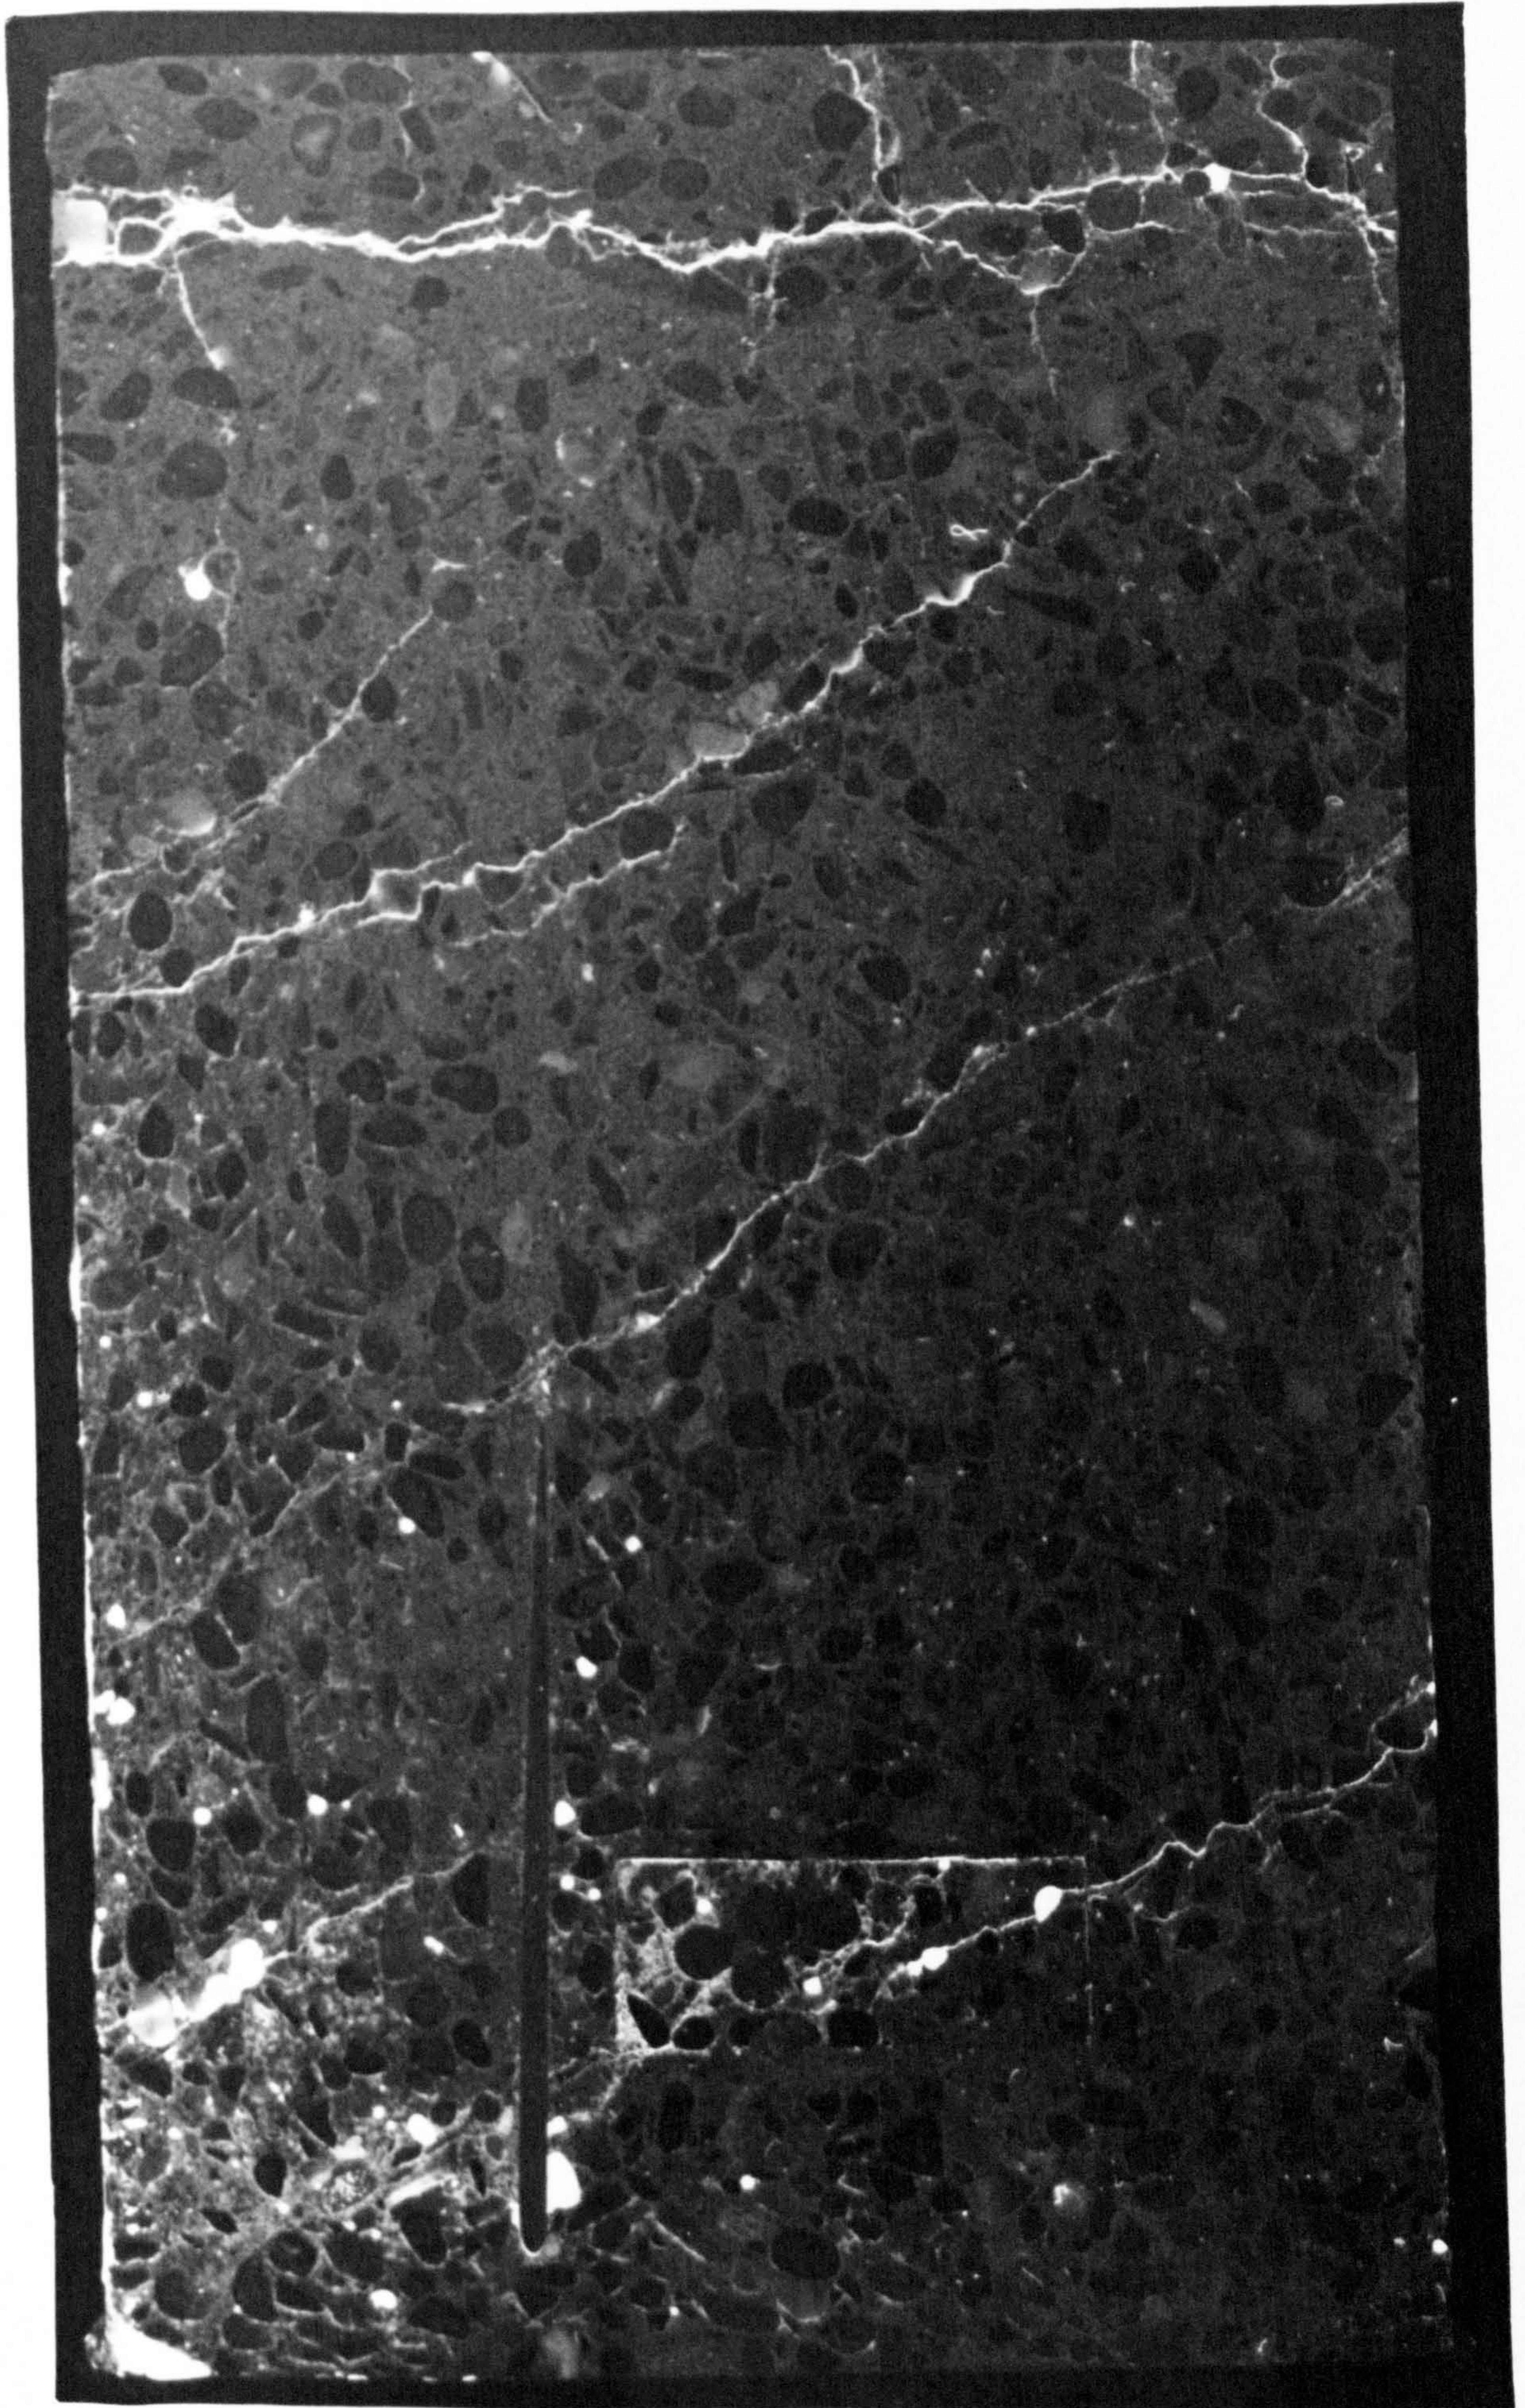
PRECAST CONCRETE CRACK PATTERN ON THE CUT FACE OF CORE 6
